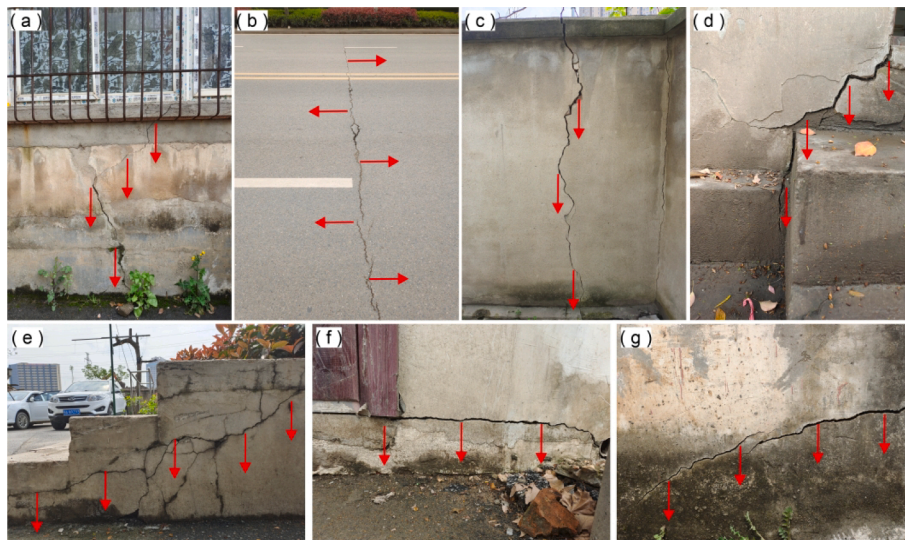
Building wall cracks and road damage due to surface subsidence in the field survey area.
